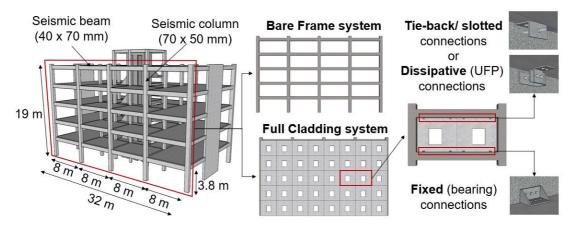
Case-study Building: global view and frame dimensions (left); building systems considered for the analyses (centre); precast concrete cladding panel configurations (right).
